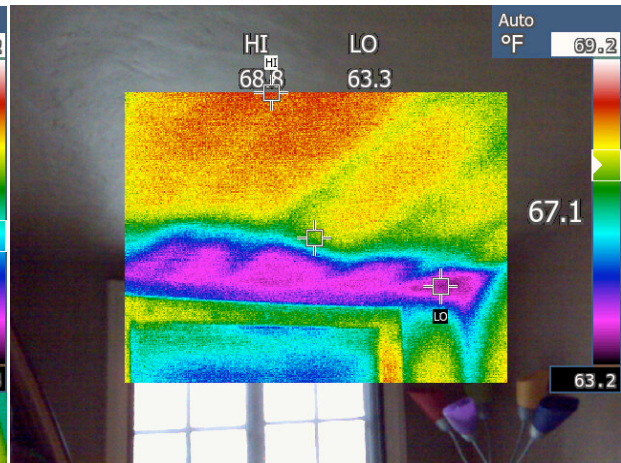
P2 missing insulation and/or air leakage at bedroom window
